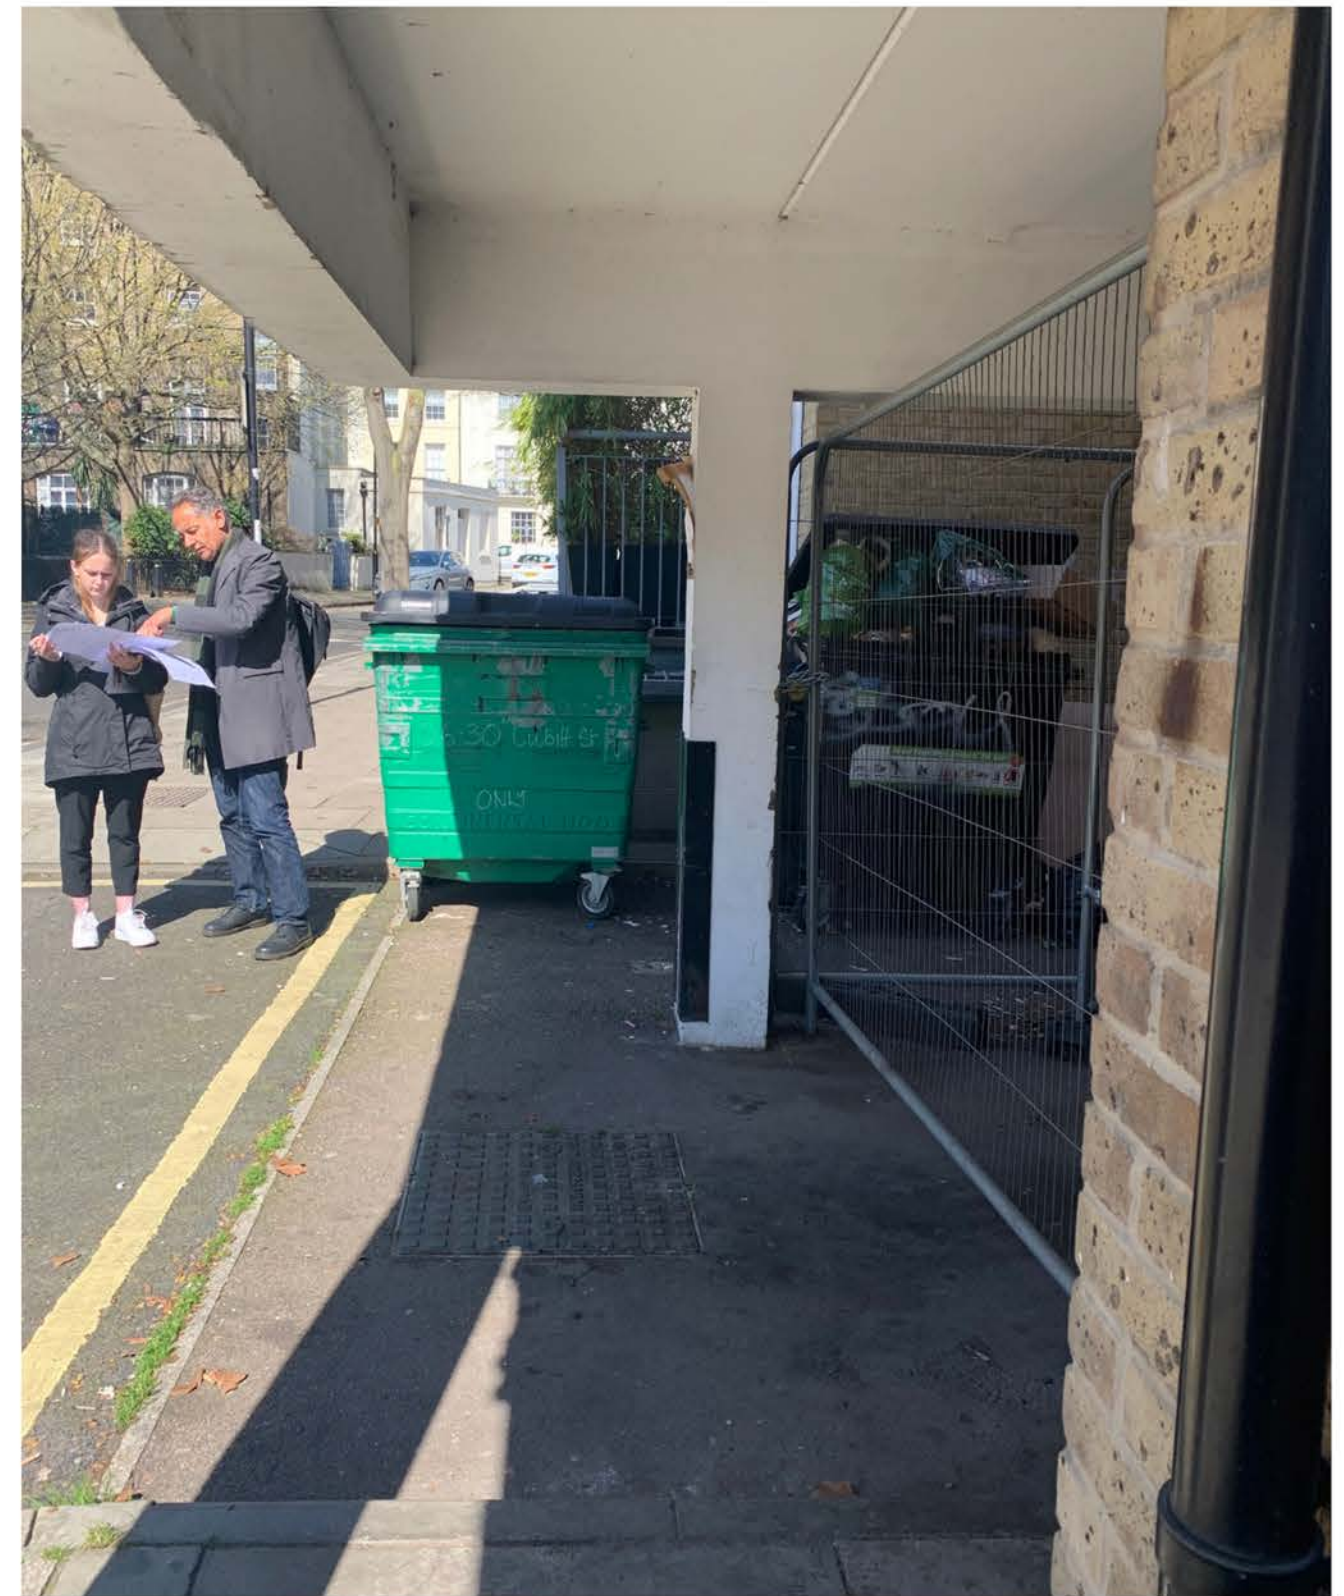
The car parking space set beneath 24 Cubitt Street with fencing.
